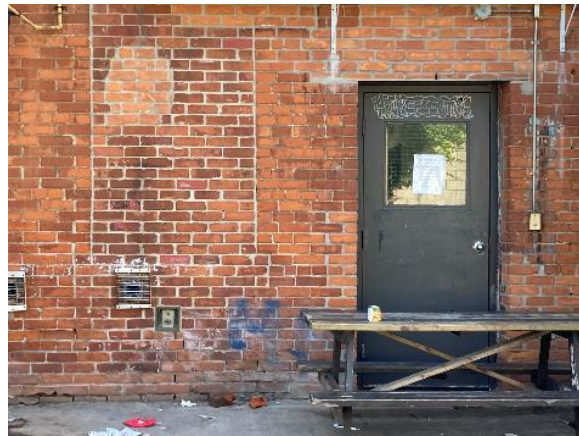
Enclosed window and entrance in west elevation of 325 James Street North
